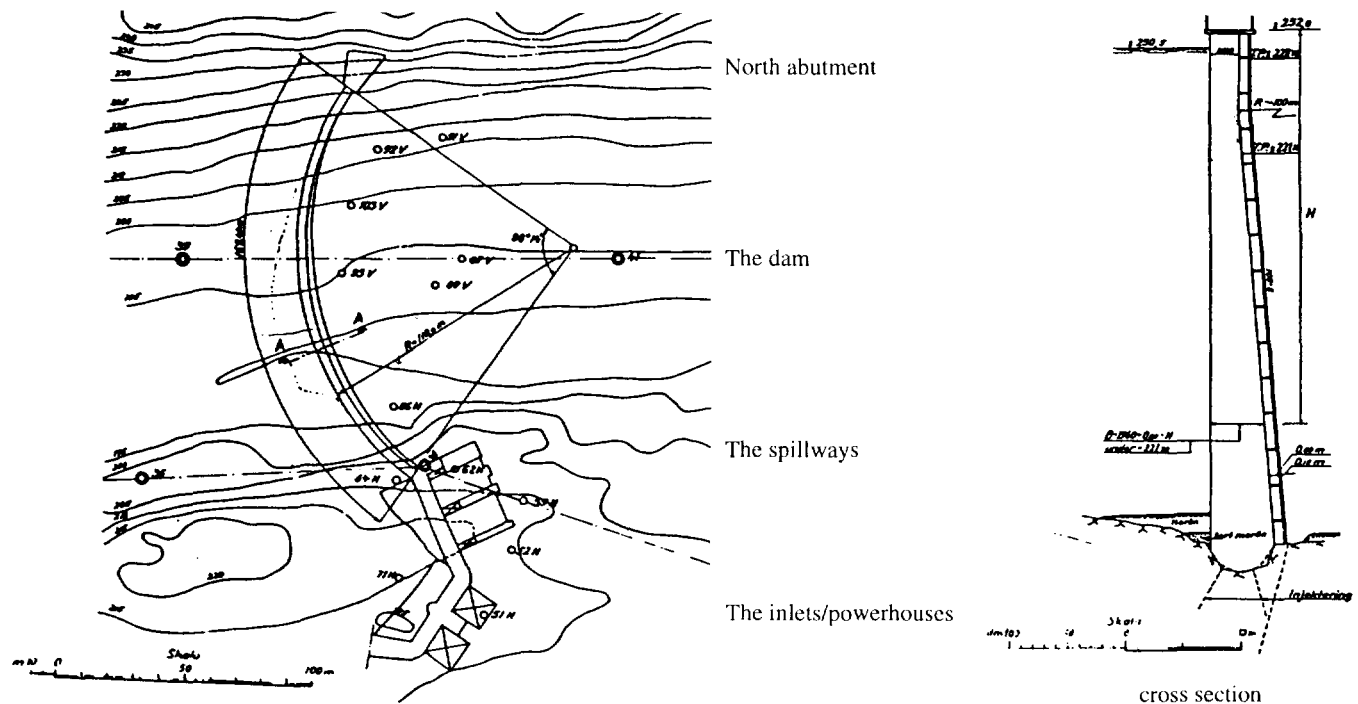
Plan view of the dam and the adjacent structures; dam cross section.
